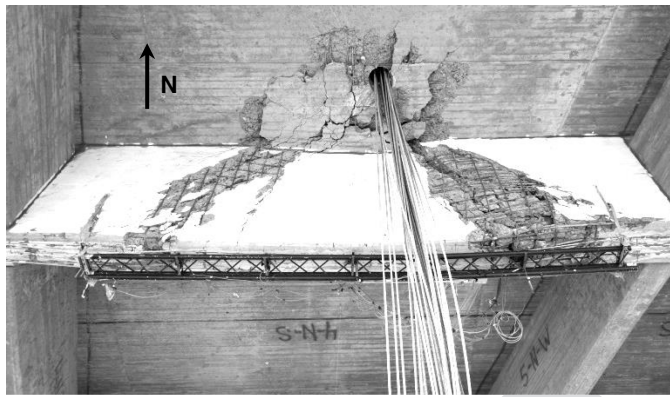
Failure of the central girder showed flexural-shear cracks on both sides of the midspan; figure also shows a curvature rig on the girder soffit and one load-anchor cable running vertically through the slab
